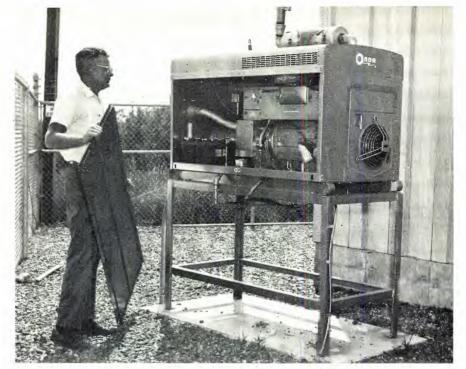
Since it was necessary to place this generator outside the building, it was given extra protection by mounting it well above high water levels.
